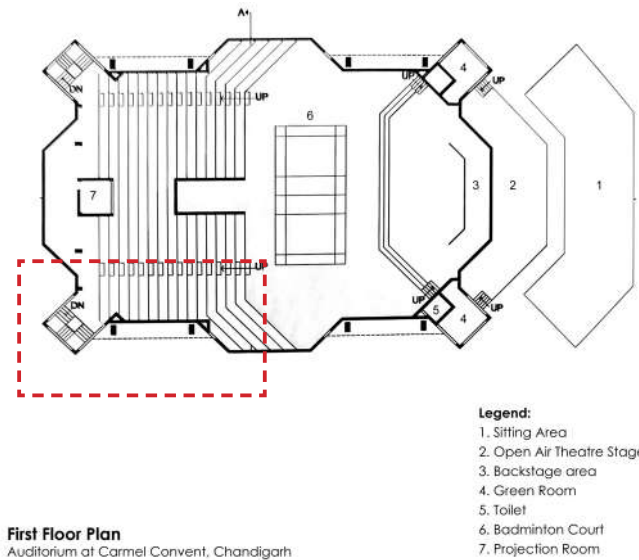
Plan of the Auditorium at Carmel Convent School showing the placement of the columns and the brick wall around it
